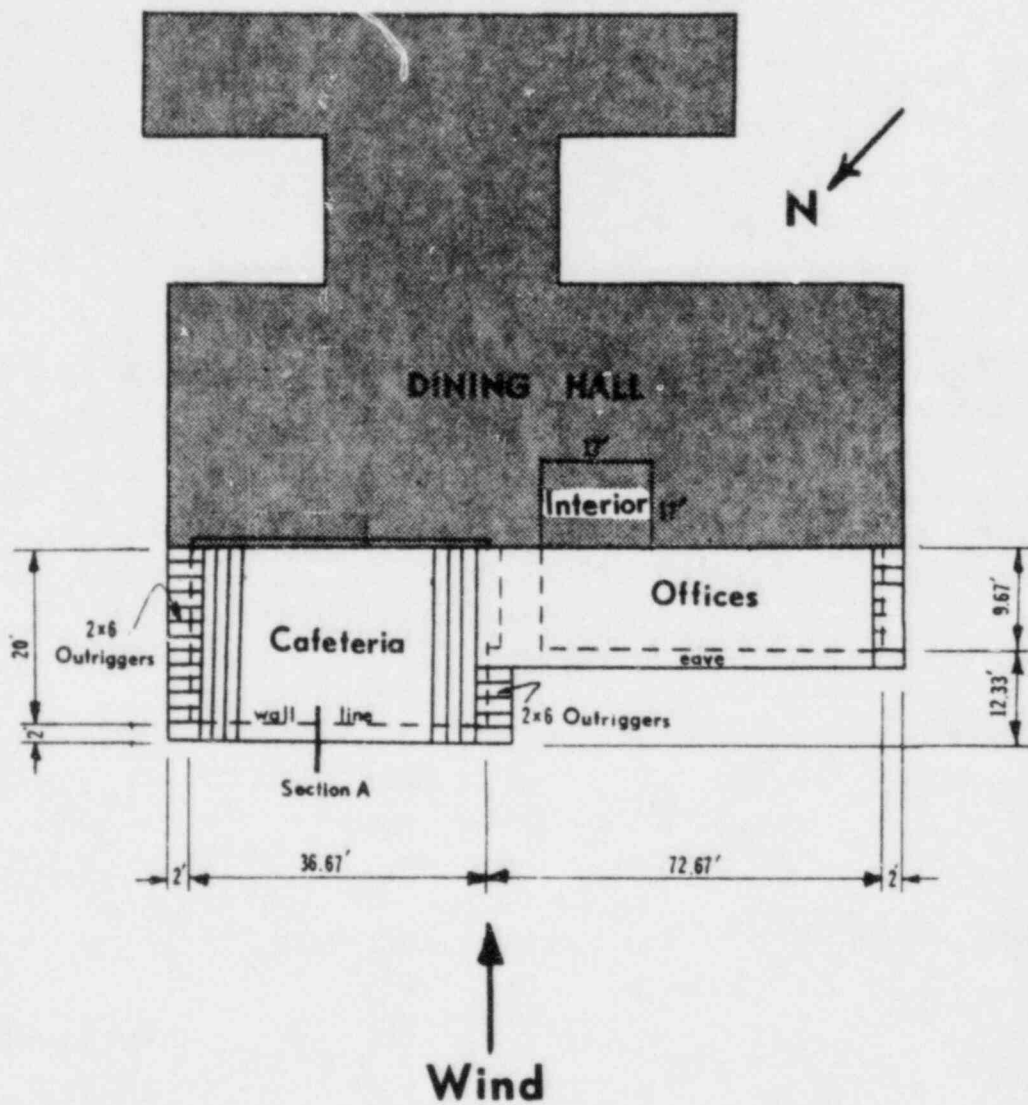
Plan view of Dining Hall showing windward roof damage (unshaded portion).
